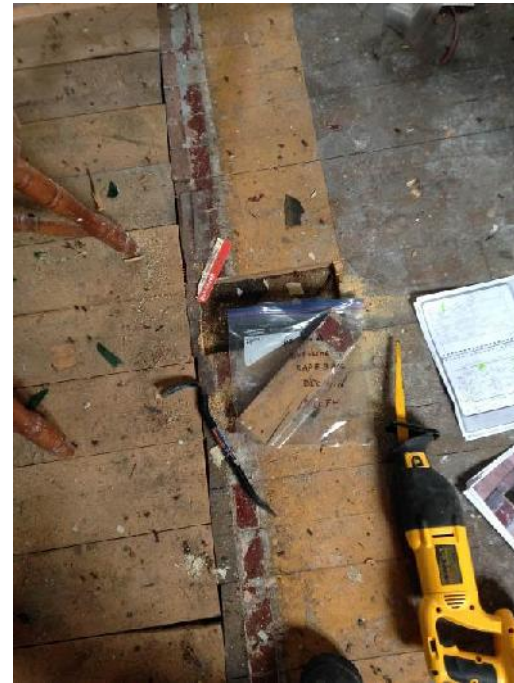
View of location of paint sample PS-5-A (including wood substrate) in Room 6 (floor).
